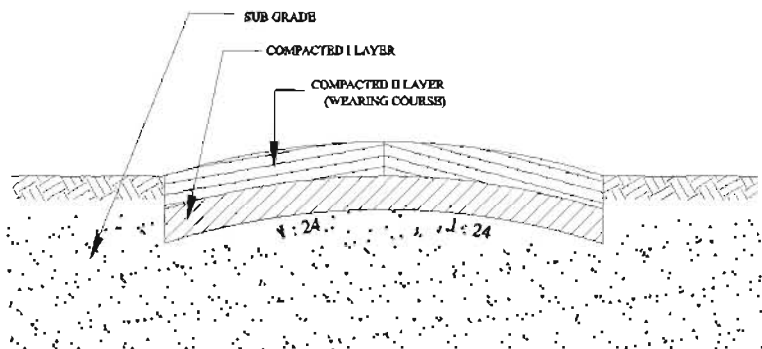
CROSS SECTION OF EARTH ROAD
